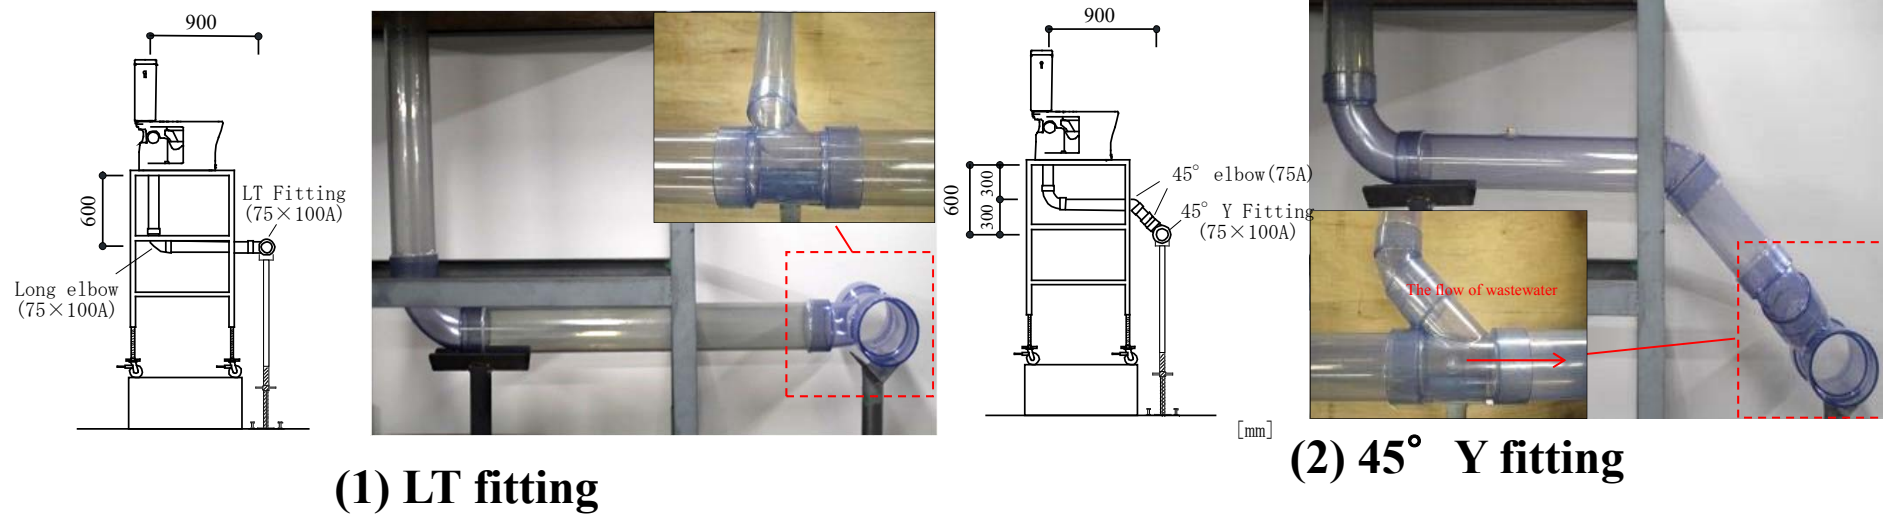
Fittings used for connecting the horizontal fixture drain branch
